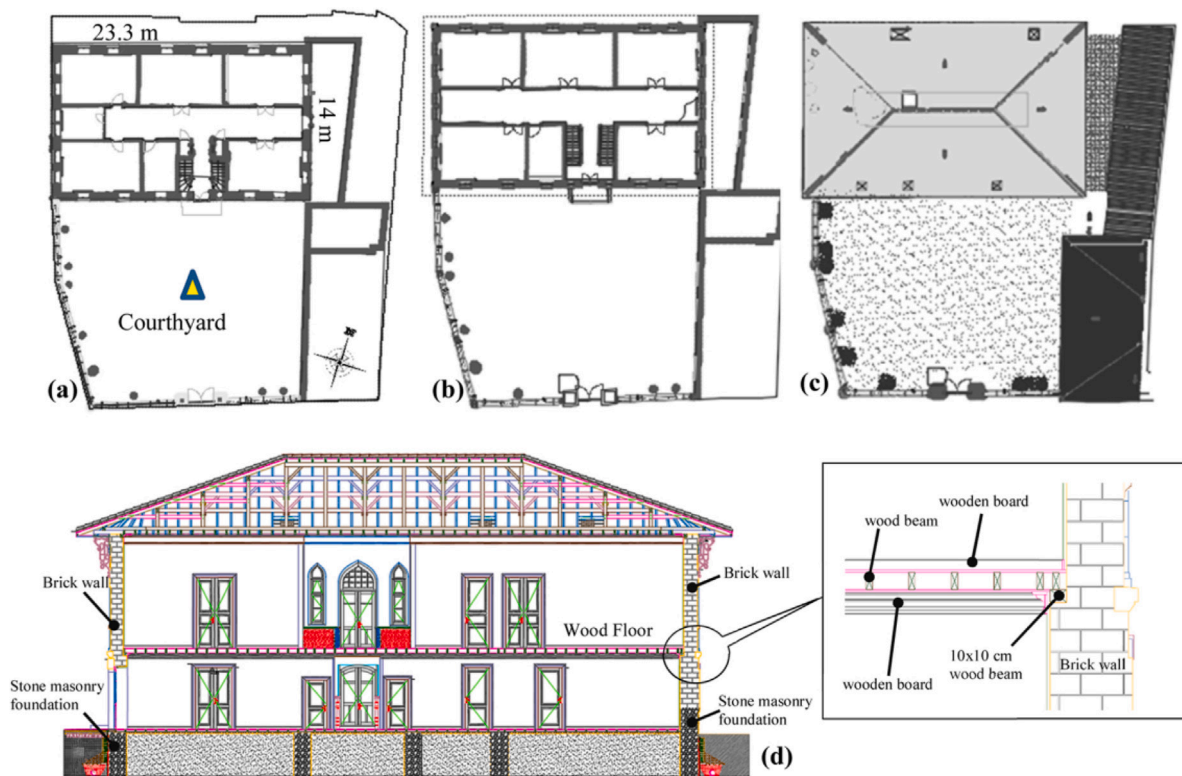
Floor plans, top and side view of the Hocailyas secondary school. (a) Ground floor, (b) first floor, (c) top view (plot dimensions: 26.1 m × 35.3 m), and (d) side view and cross-sectional structural details of the building [218].
